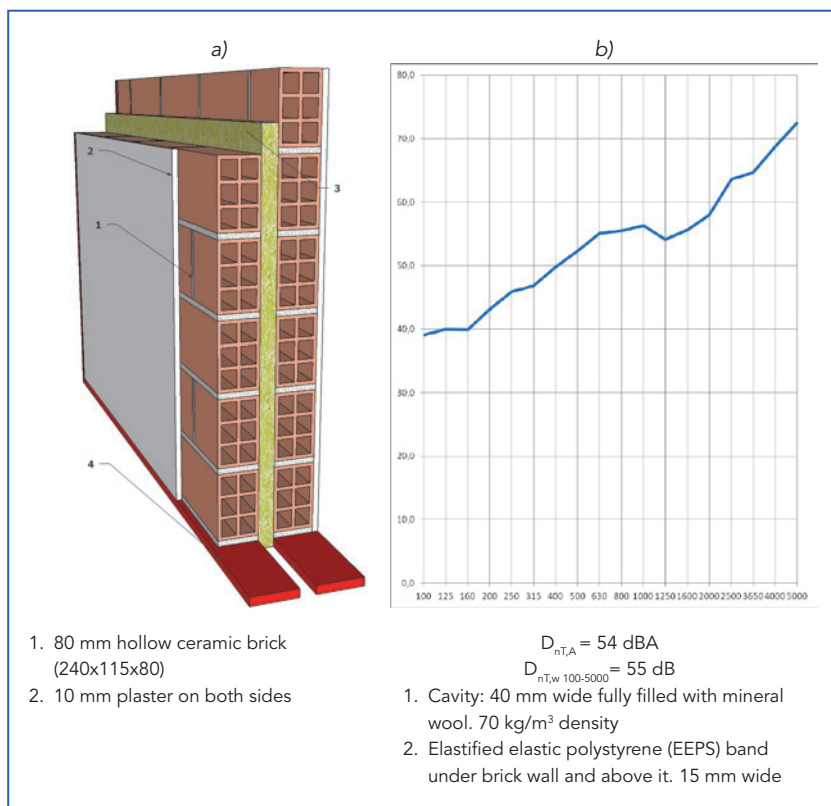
Building with continuous floor slabs and acoustic strip under a masonry cavity separating wall. [12] - (Spain).
